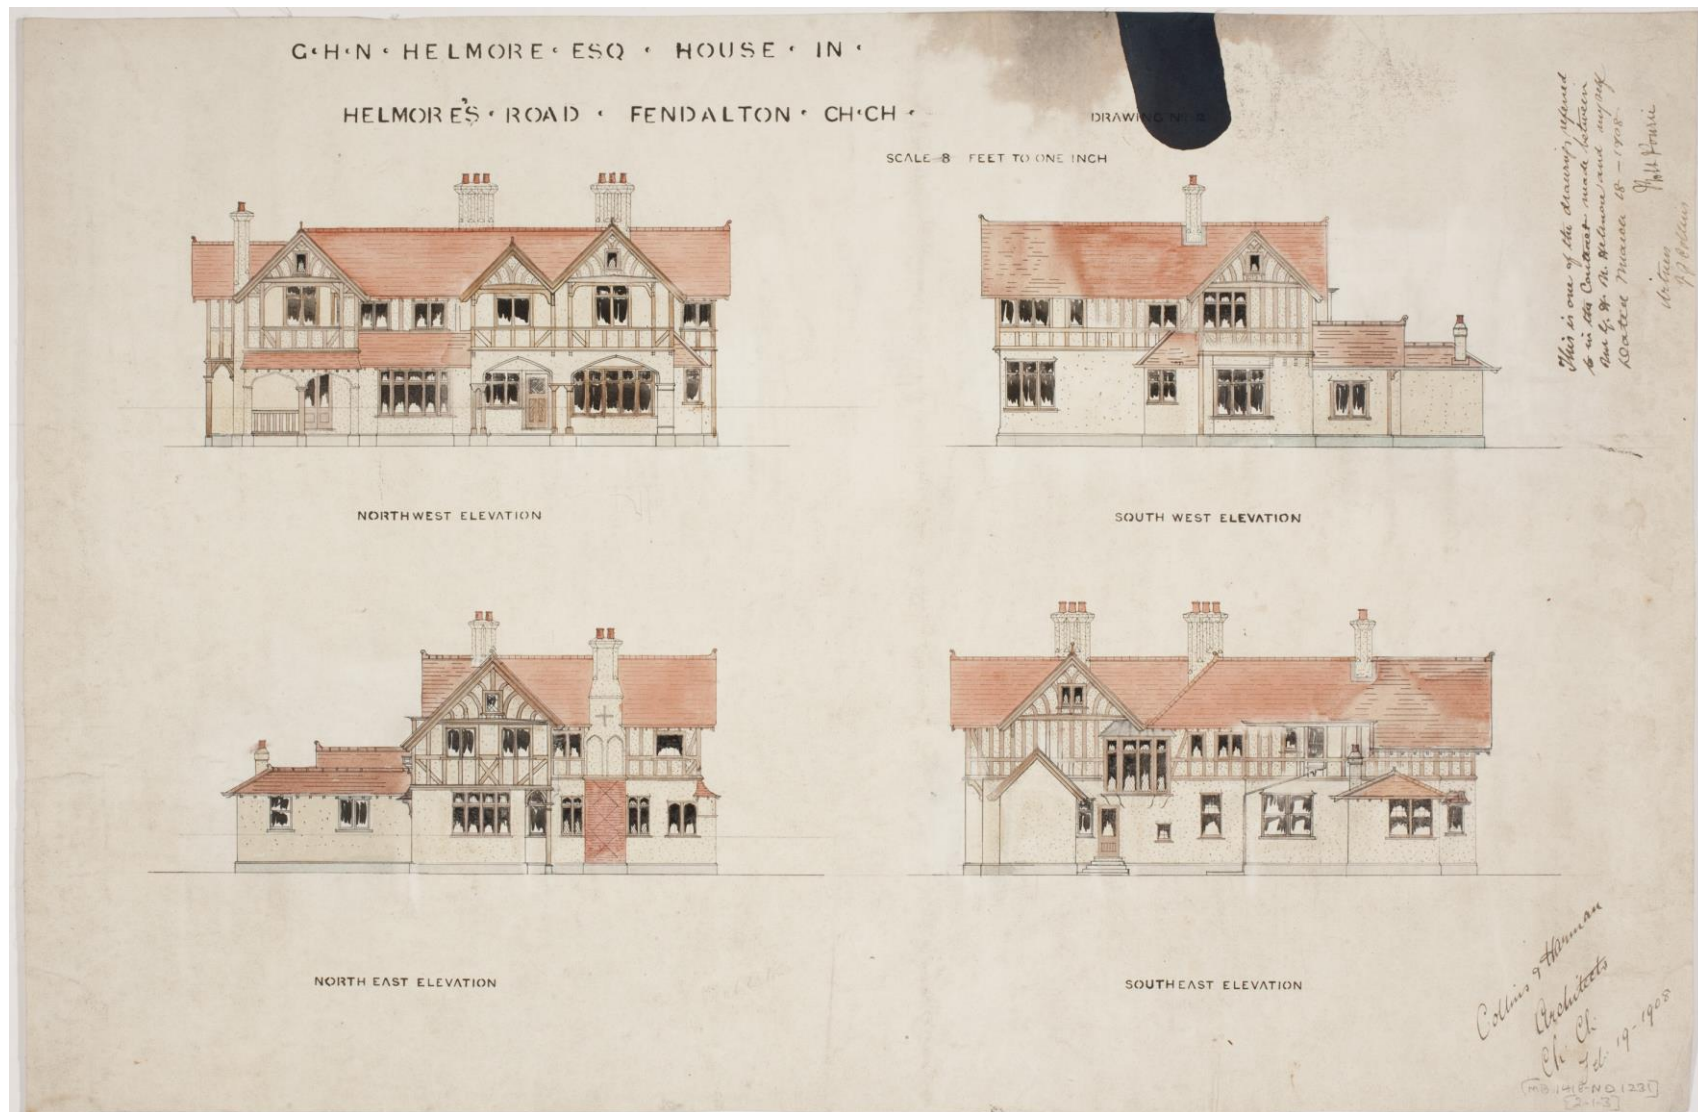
Collins and Harman, G. H. N. Helmore, House in Helmore's Road, Fendalton, Ch-ch., elevations (1908).
